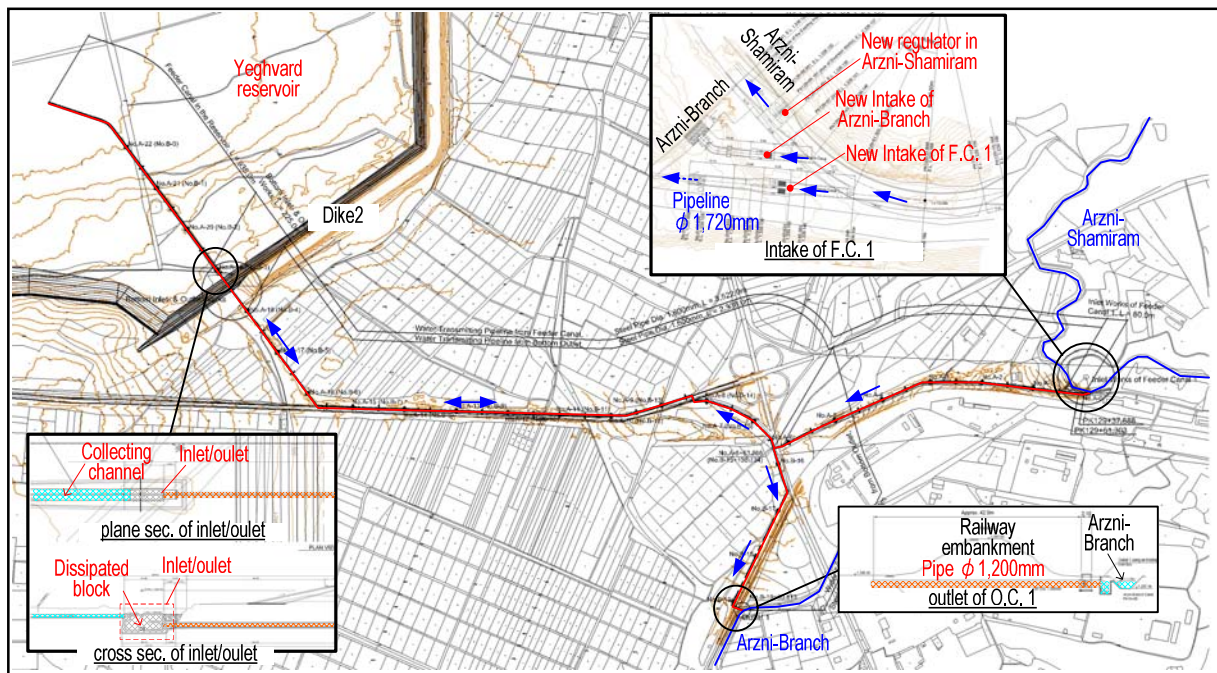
Plan of Feeder Canal 1 and Outlet Canal 1
